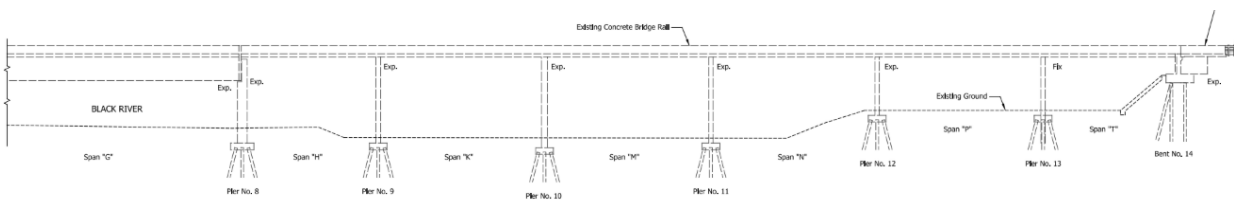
Elevation View of Spans 7-13 of the Bridge (NBI 33240) (2015)
